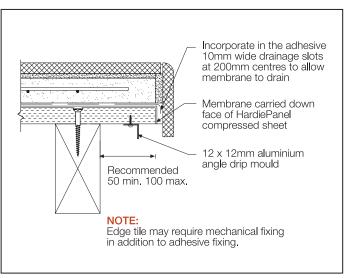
METHOD 1 - DECK EDGE DETAIL USING TILE
